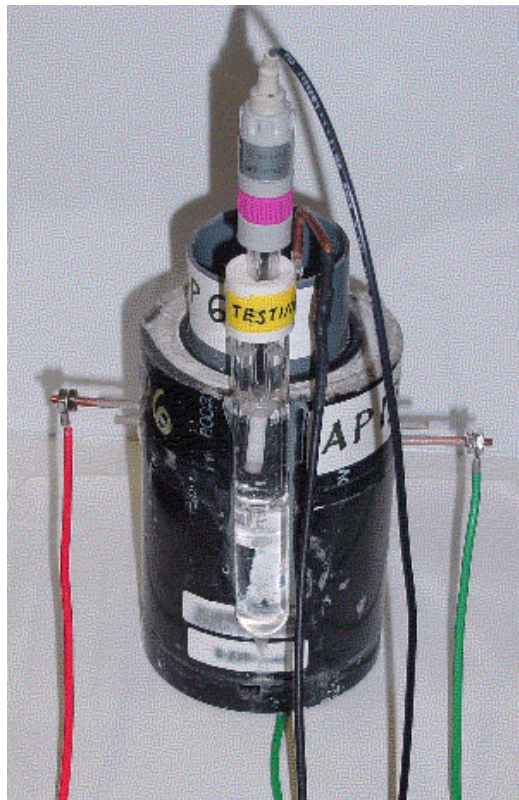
Actual ACT Test Specimen Ready for Testing.
